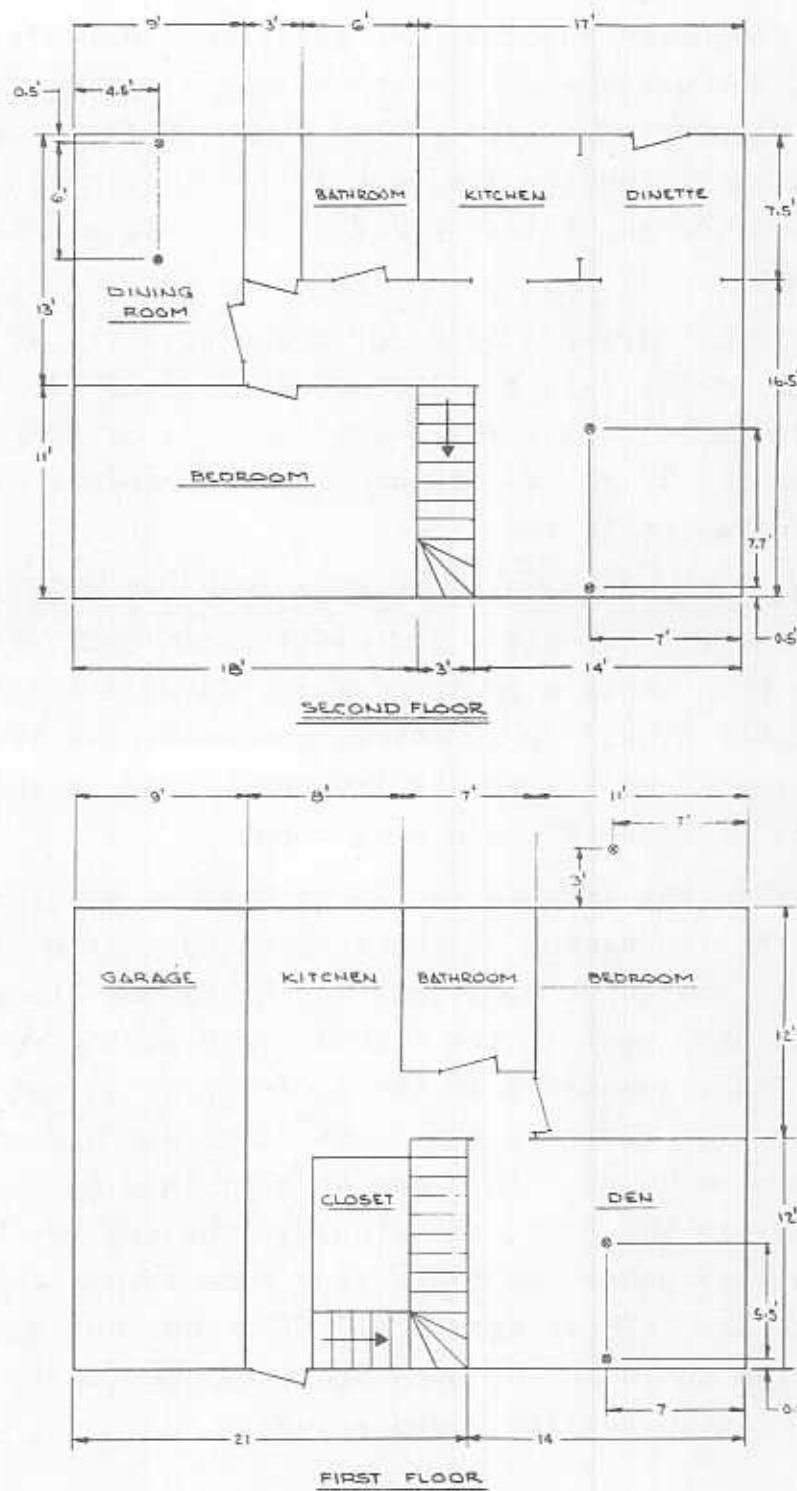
FLOOR PLAN, PRIVATE RESIDENCE, 1546 E 16TH STREET,
